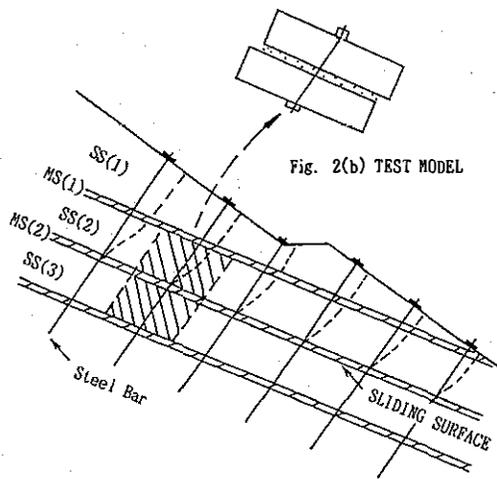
(a). STEEL BAR DEFORMATION OF ASSUMED SLOPE ALTERNATING SANDSTONE AND MUDSTONE
